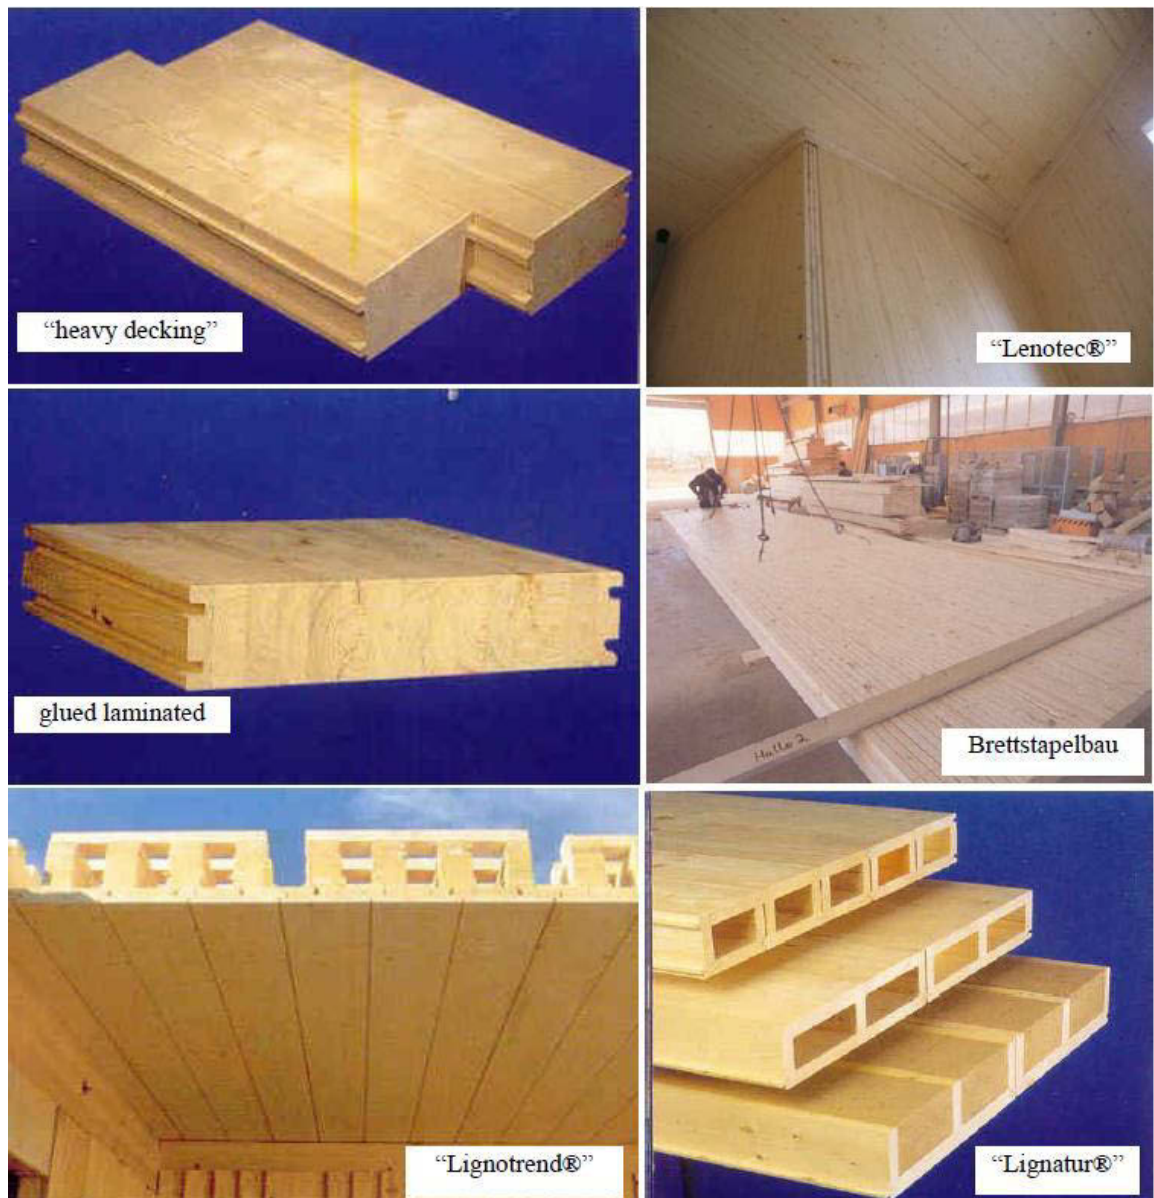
“Modern” plate floor systems (Jorissen 2006)
